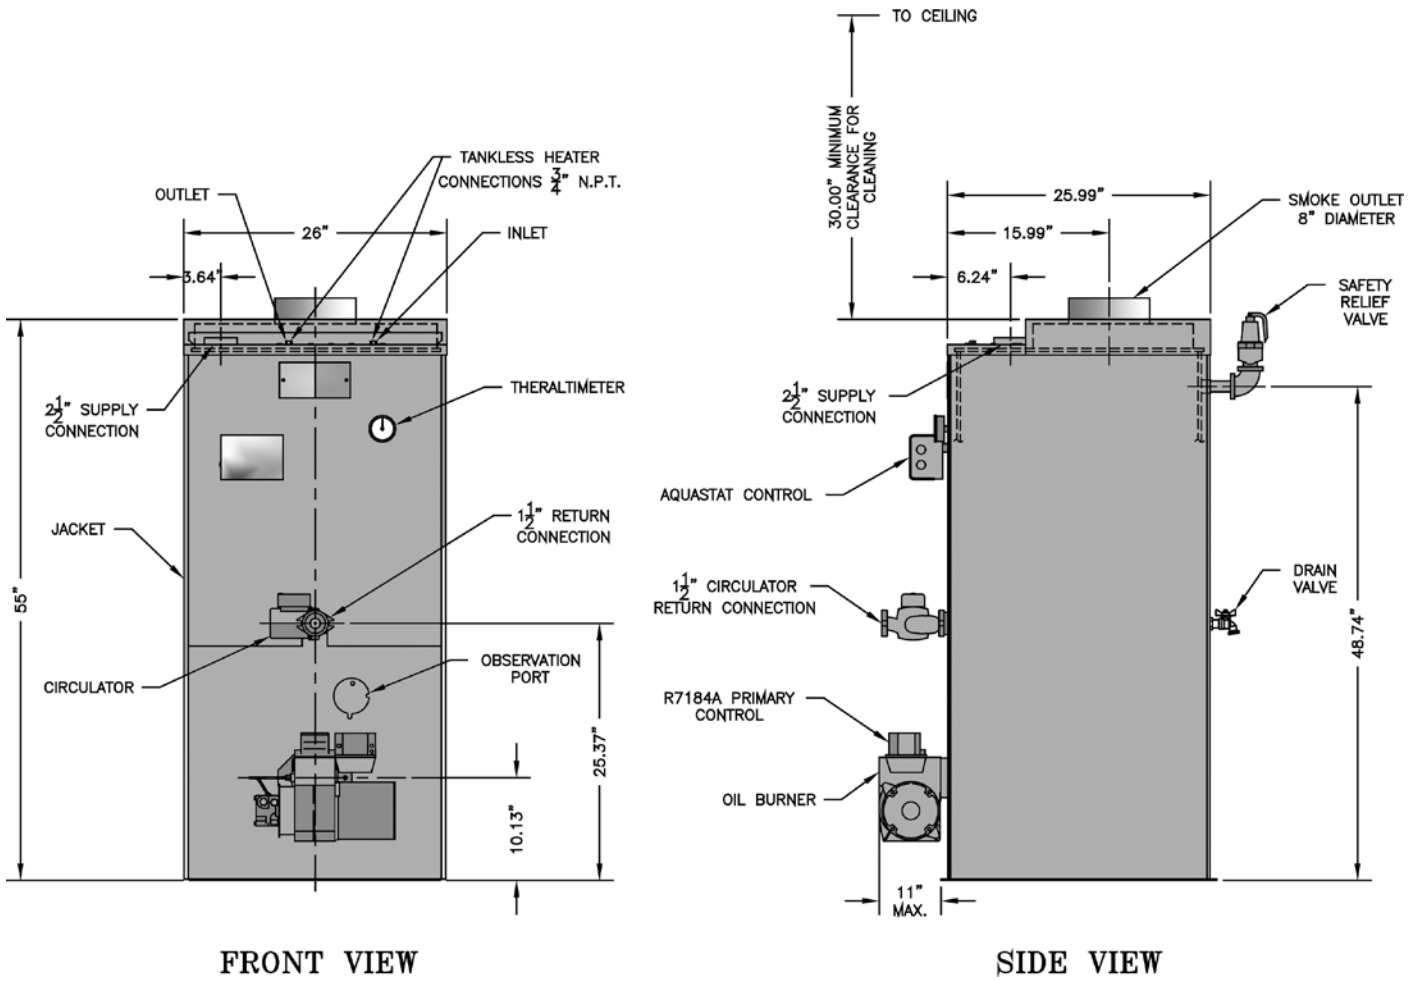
A: RSA Packaged Boiler (RSA170 / RSA285)
